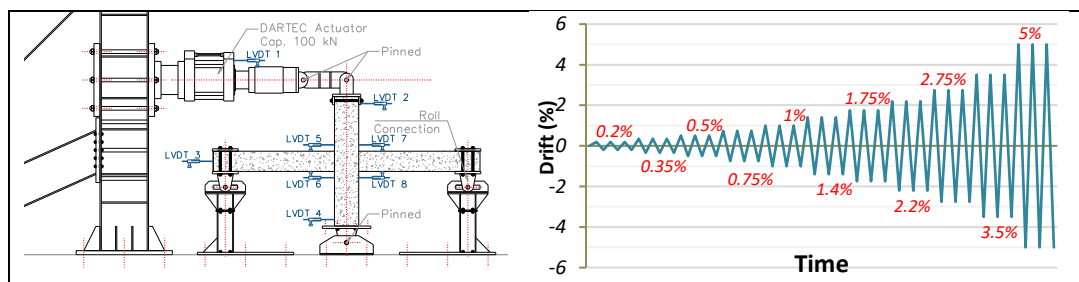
Beam-column joint test setup (left) and loading program of the test (right)
